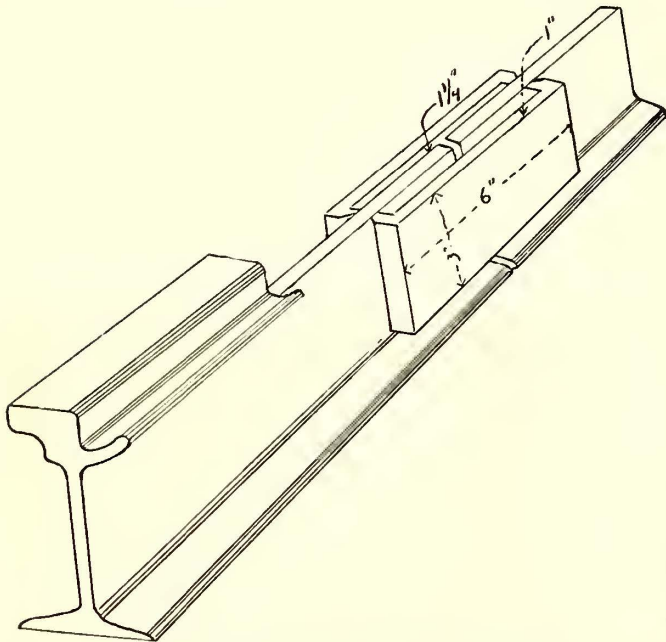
LATER TYPE OF WELDED JOINT
